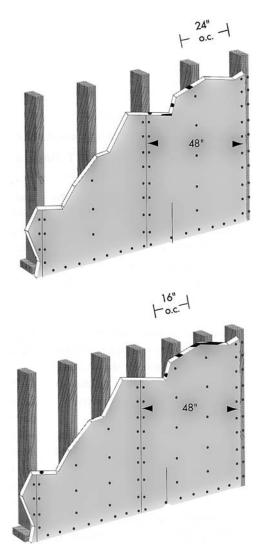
Vertical application of gypsum wallboard to wood-framed construction.
